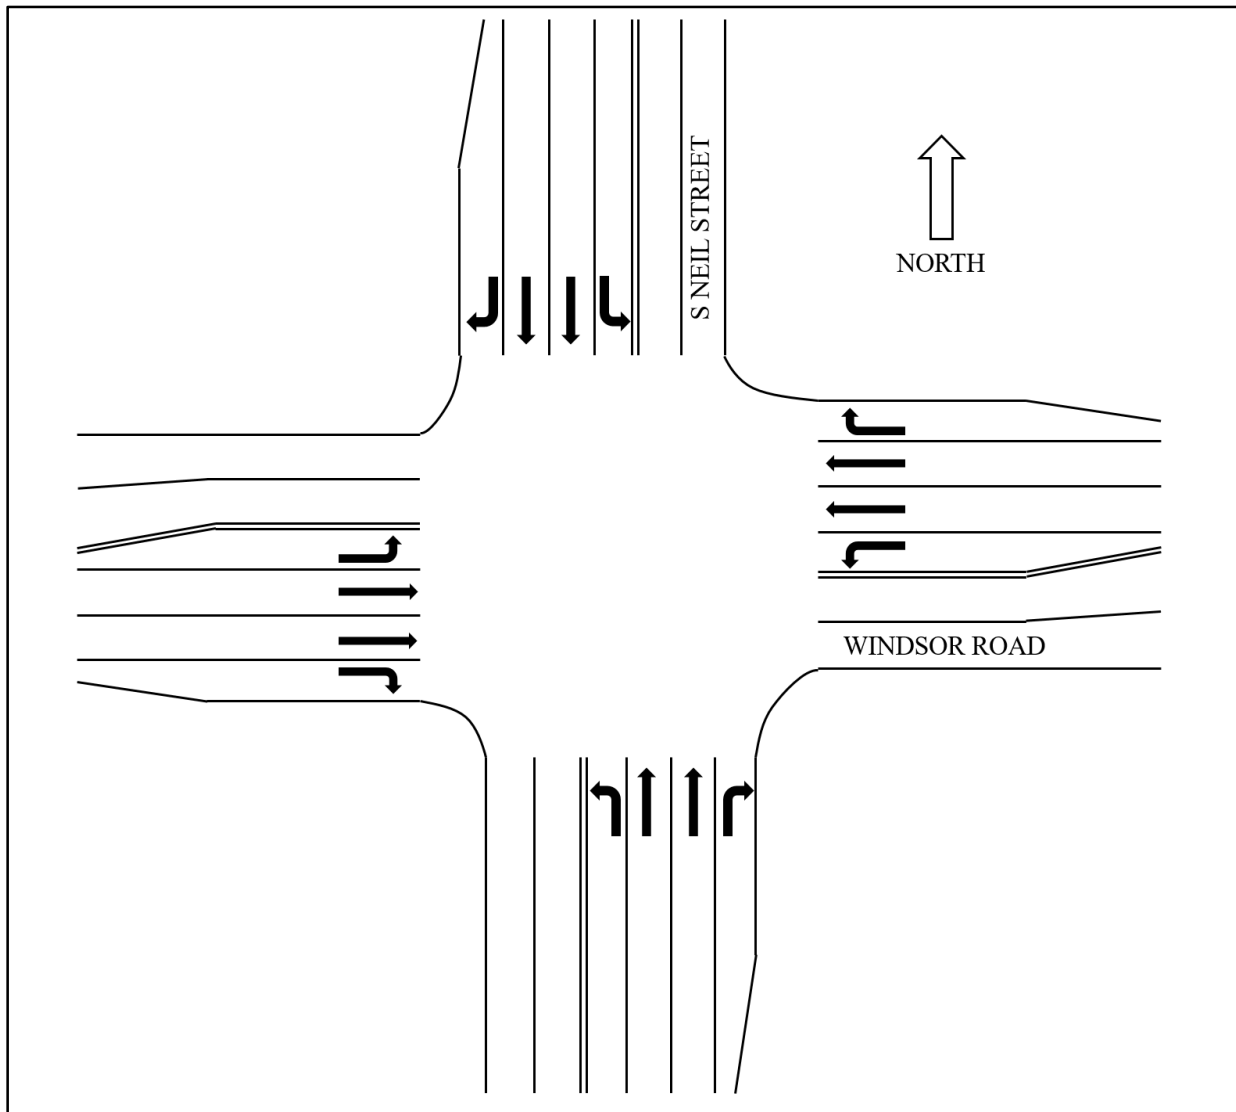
Geometry of the intersection of Neil Street and Windsor Road
